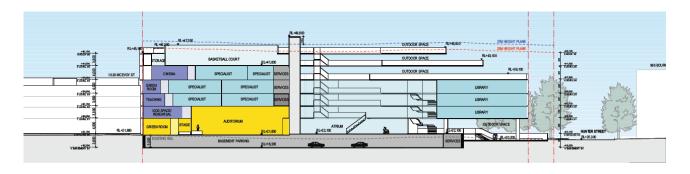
North-south cross section of indicative building envelope. Source: Plus Architecture Urban Design Report
